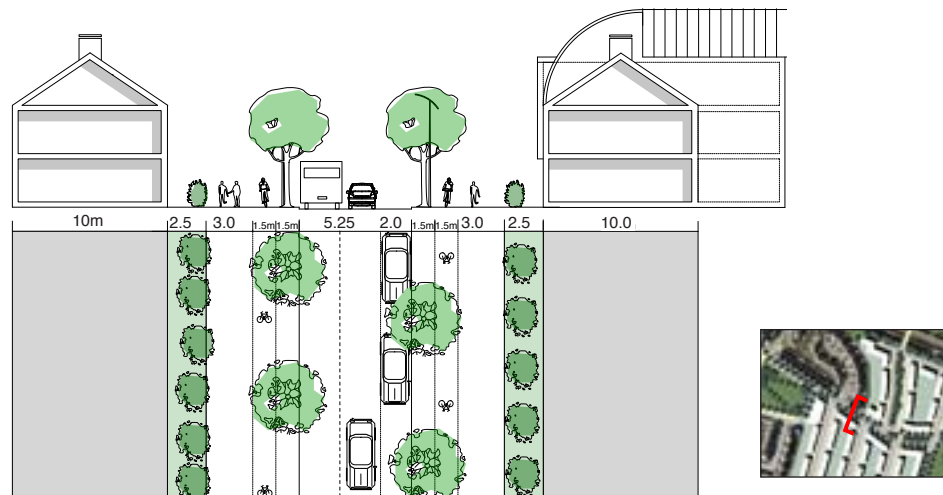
Indicative section through Lissywollen Avenue with townhouses
